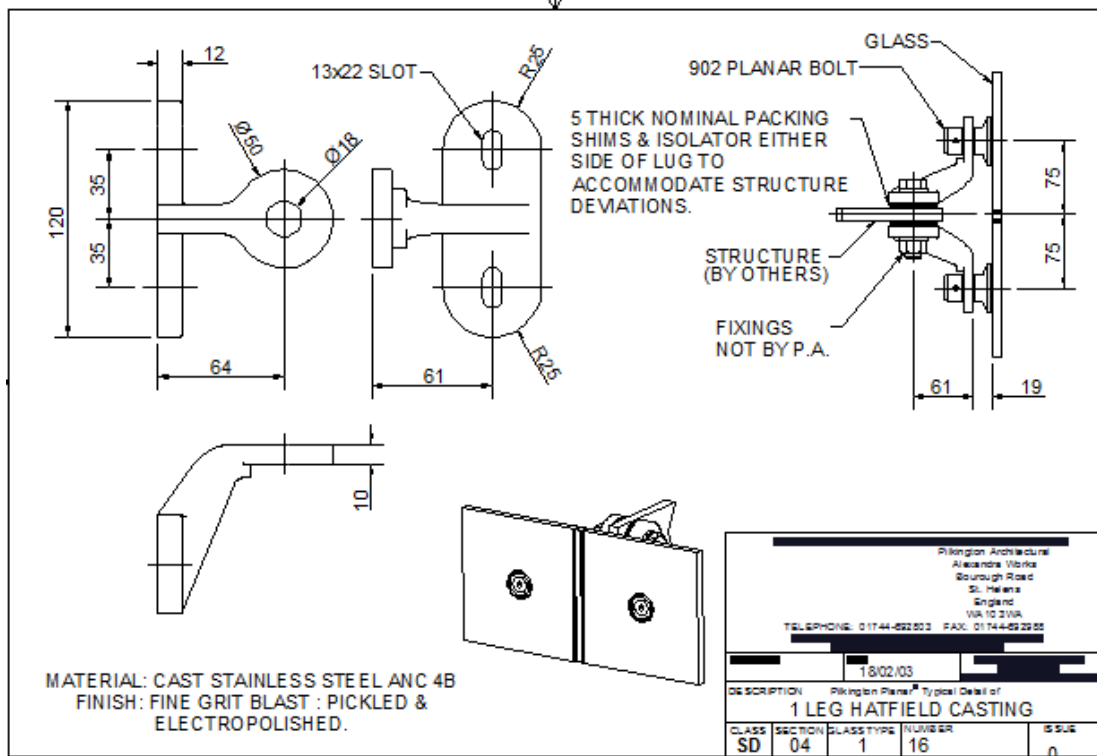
1 Leg Hatfield Casting for Curtain Wall System (Pilkington, 2009).
